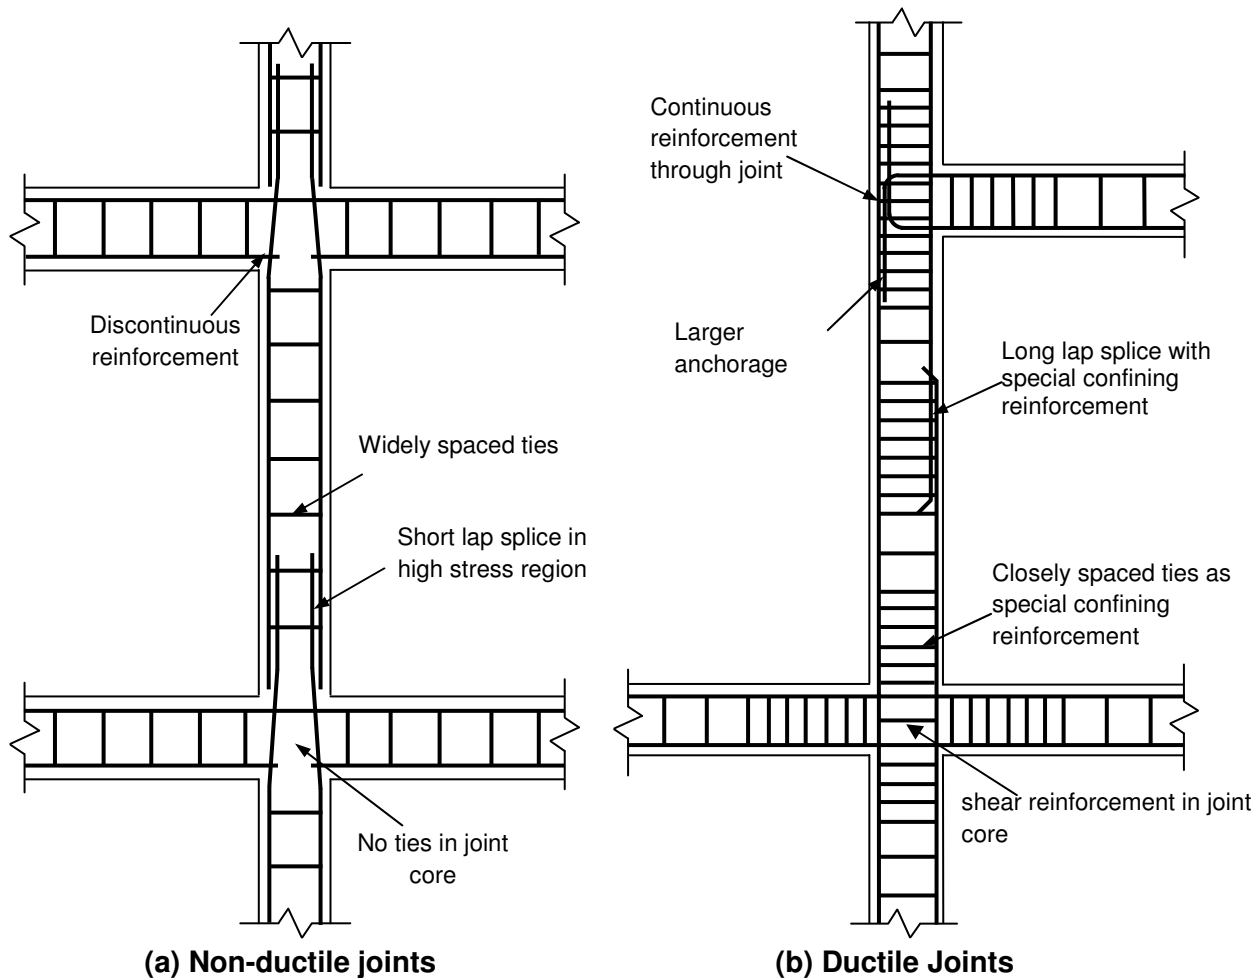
Reinforcement detailing of joints prescribed by (a) older and (b) new codes of practice
